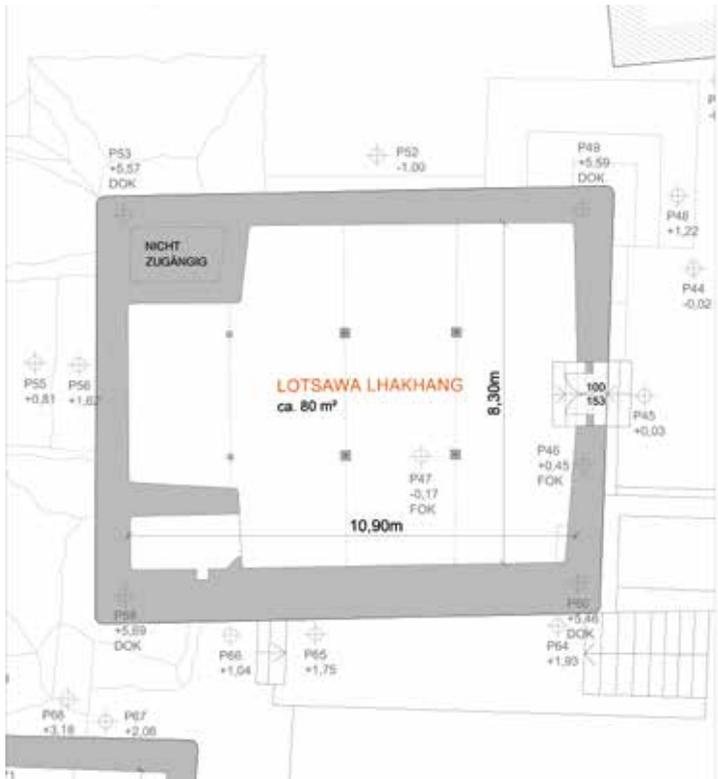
Site plan and plan of Lotsawa Lhakhang.
